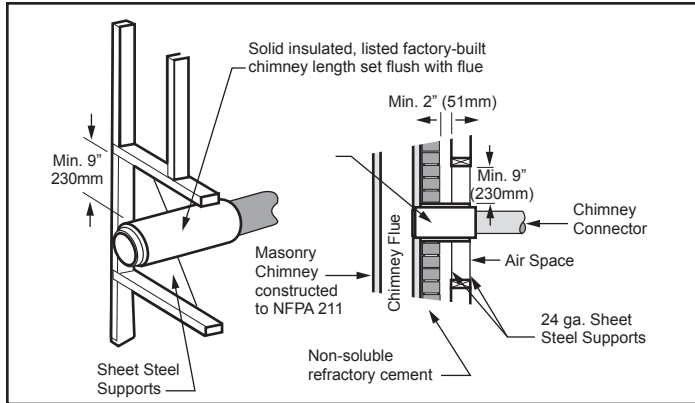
Wall Pass-through using factory-built insulated chimney section.
